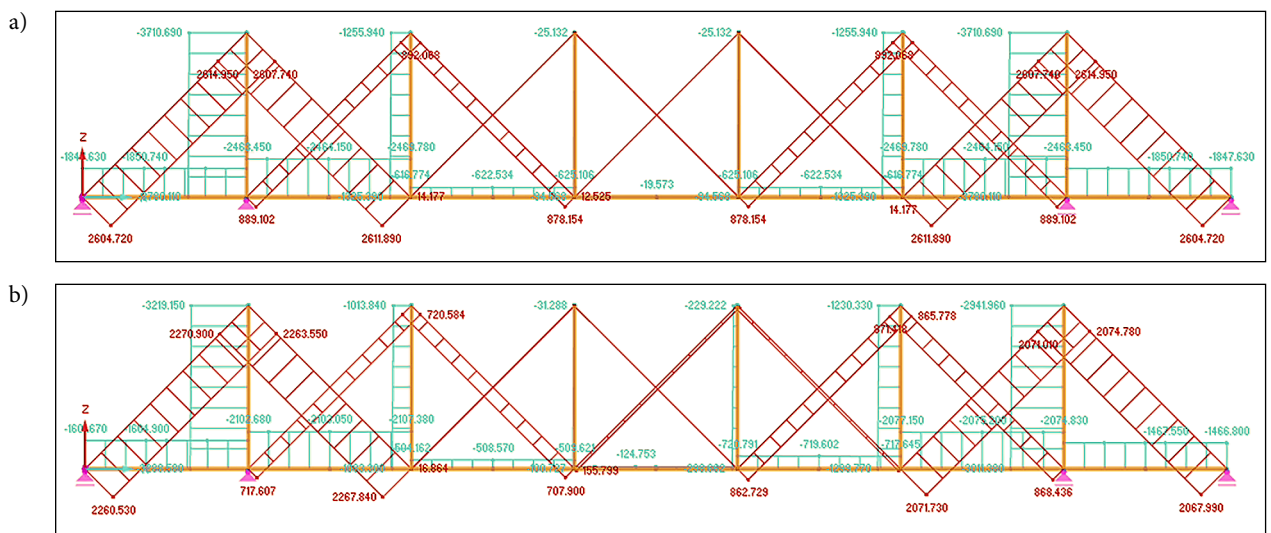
Equal pylons bridge. Axial forces: a) under symmetrical loading; b) under asymmetrical loading
